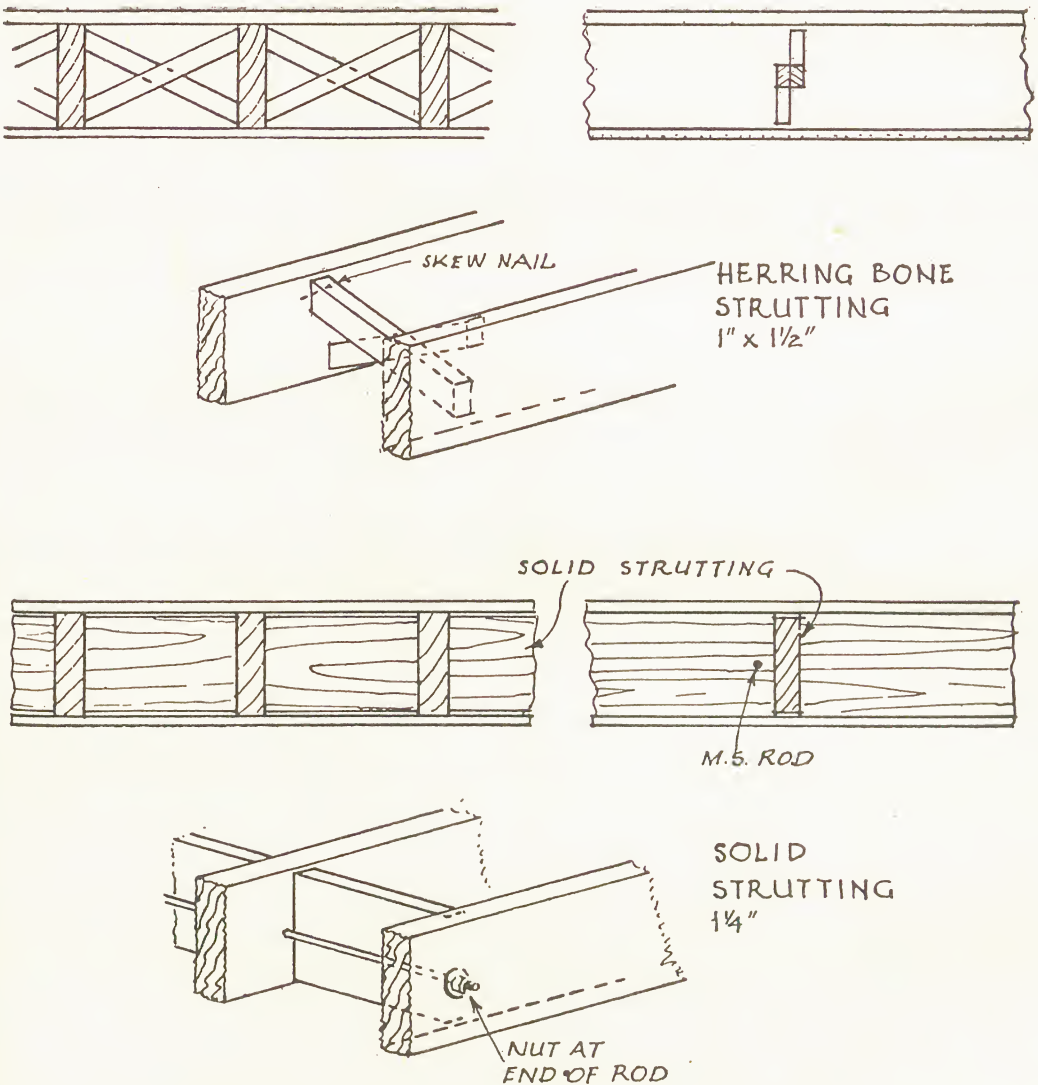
Methods of strutting floors to provide lateral stiffening.
